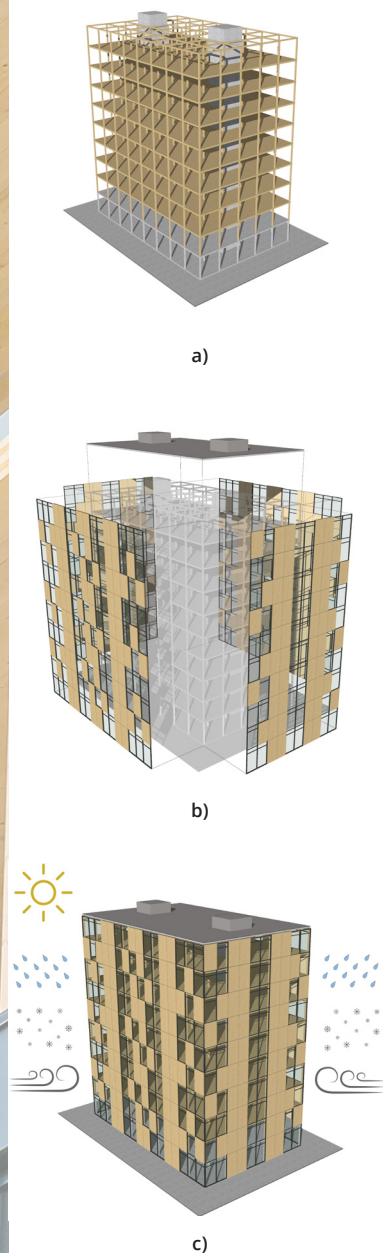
A mass timber building model showing a) the mass timber structure, b) the enclosure, and c) the building subjected to various environmental loads.
